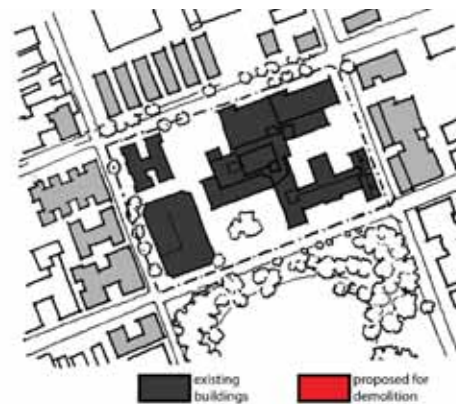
Schematic Site Demolition proposing maintaining and restoring all existing buildings on the site
